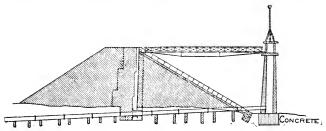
Section of Dam, Inlet Tower and Pipe.
